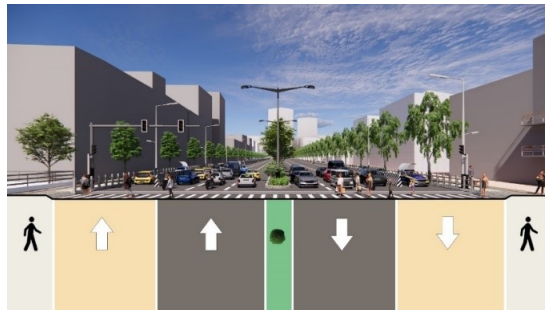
Perspective sectional view of 40m wide road (North side, Section at AA)
